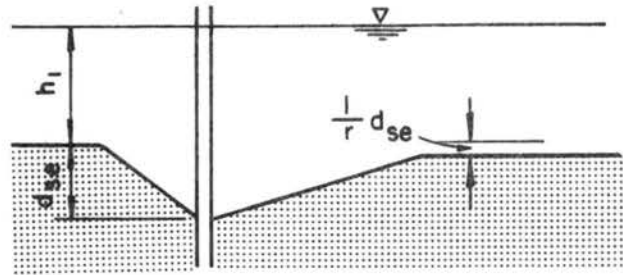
Definition Sketch for Pier and Abutment, from Laursen (46).
